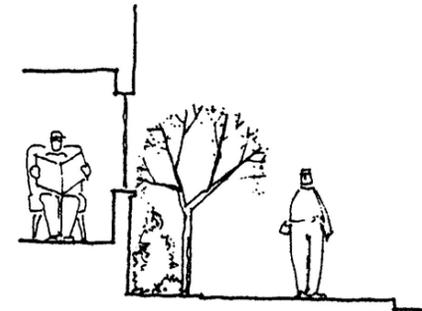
Where a setback from the sidewalk is small, raising the floor level up more than 4' above the sidewalks and/or providing a planting bed can provide sufficient transition.
